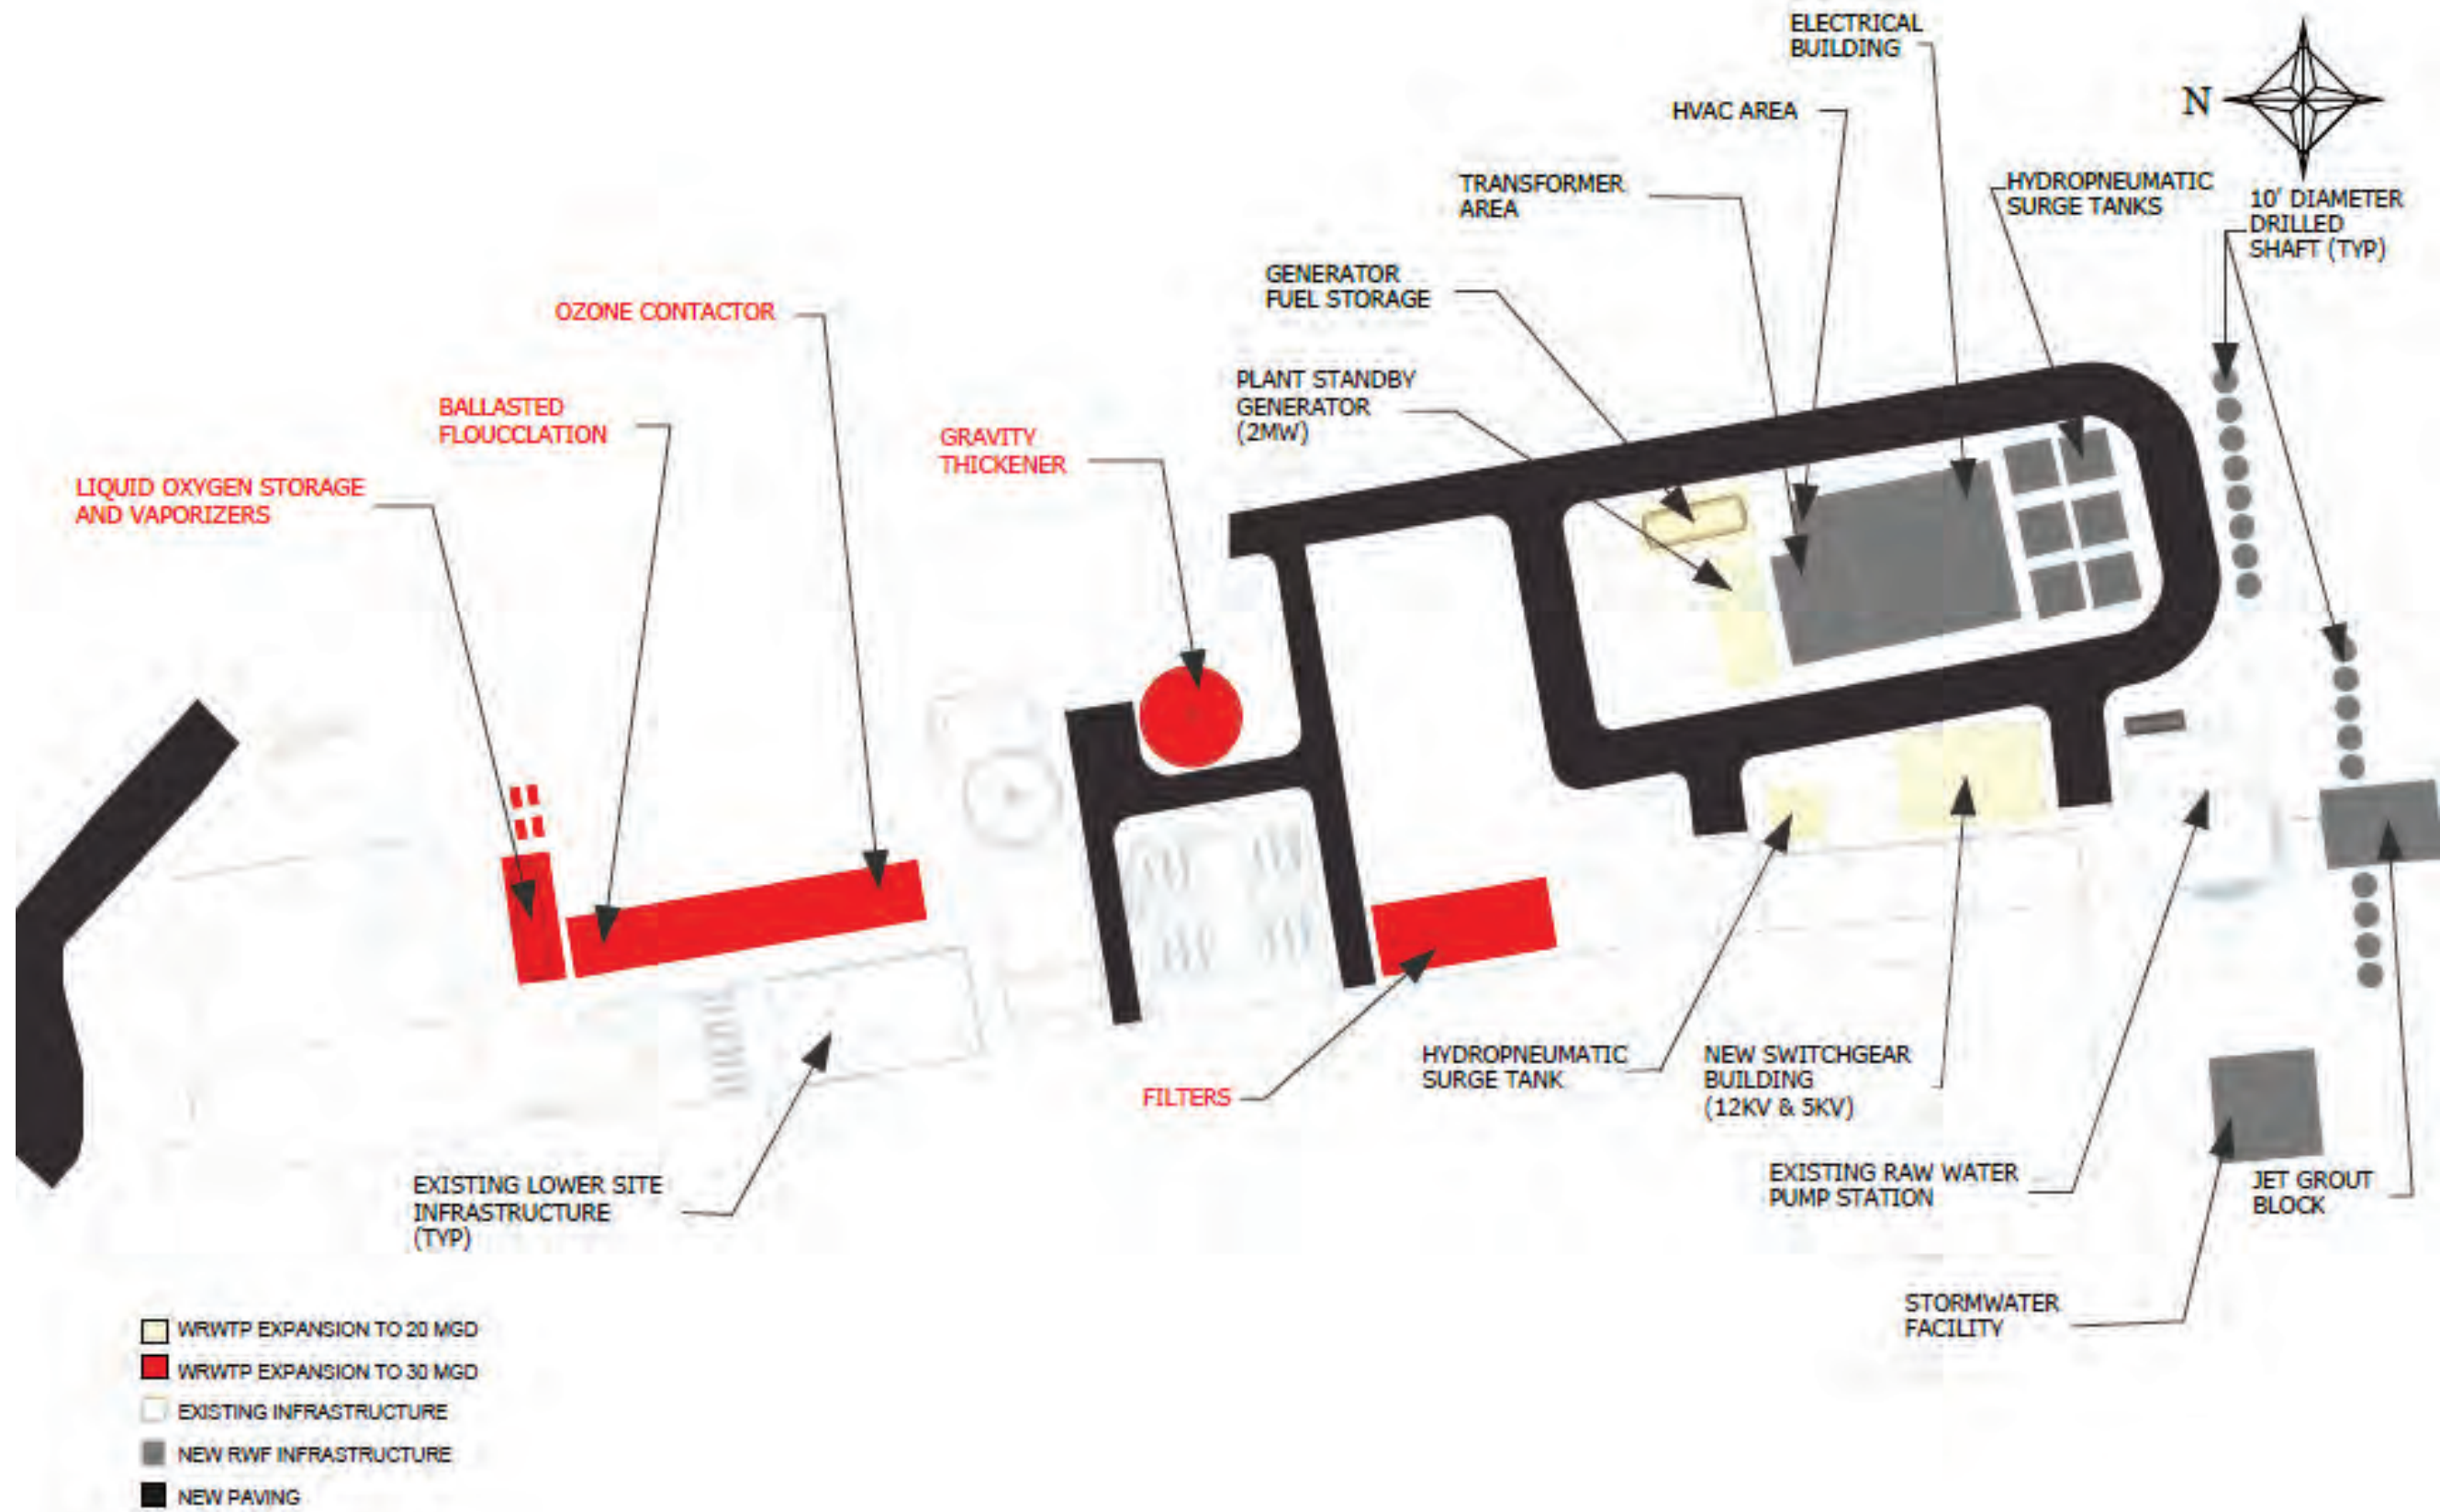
Site Plan – 30-MGD Capacity Expansion
